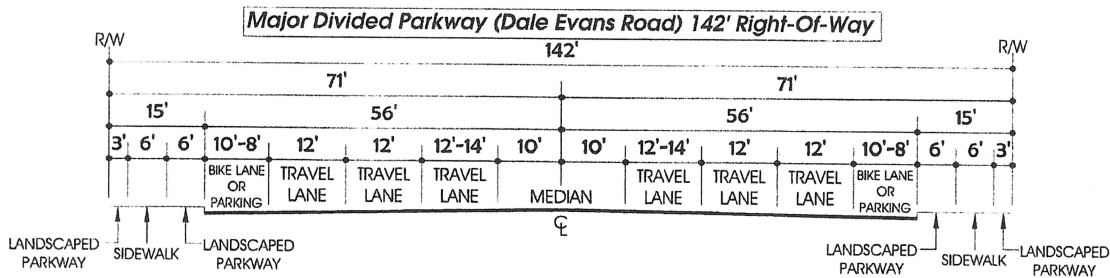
TOWN OF APPLE VALLEY GENERAL PLAN STREET SYSTEM
